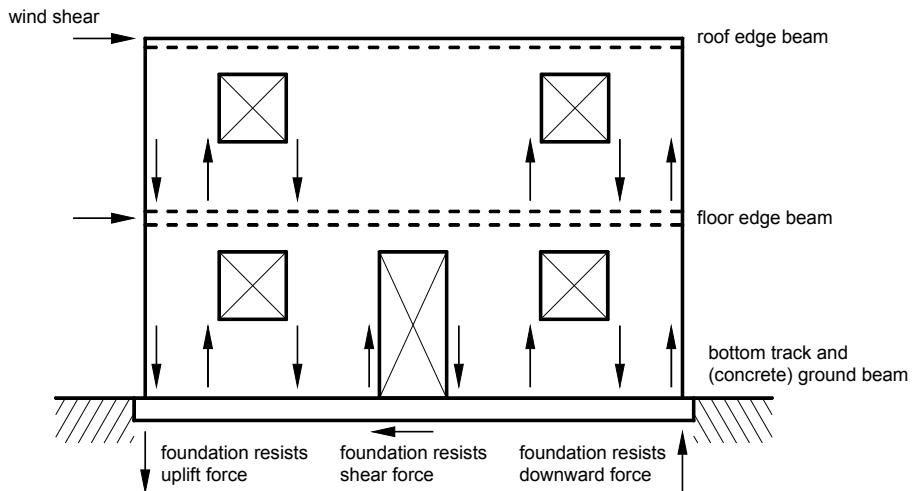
Improved treatment of diaphragm action in a cassette wall (Davies, 2005)
